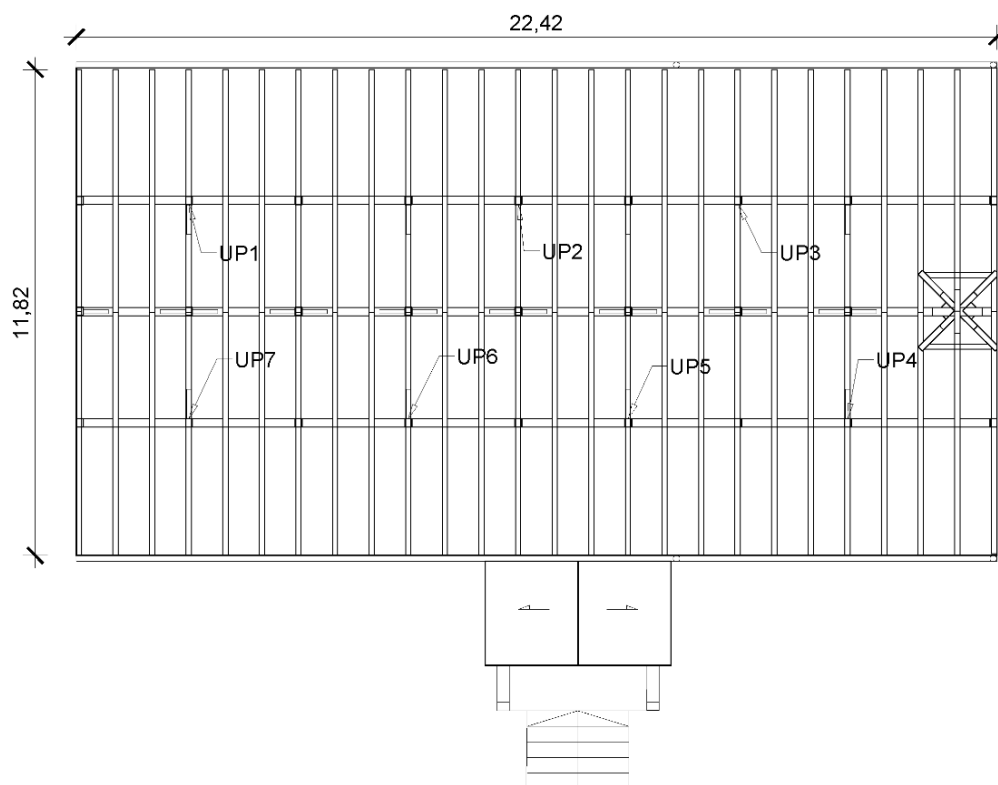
Test sites of the roof truss components using the instrument UK1410 Pulsar
